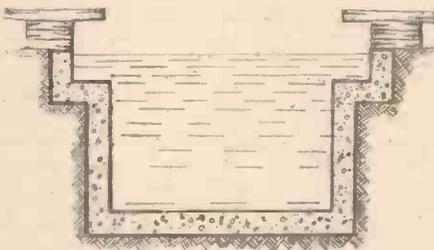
Method of arranging dwarf walls surmounted by projecting coping slabs.
